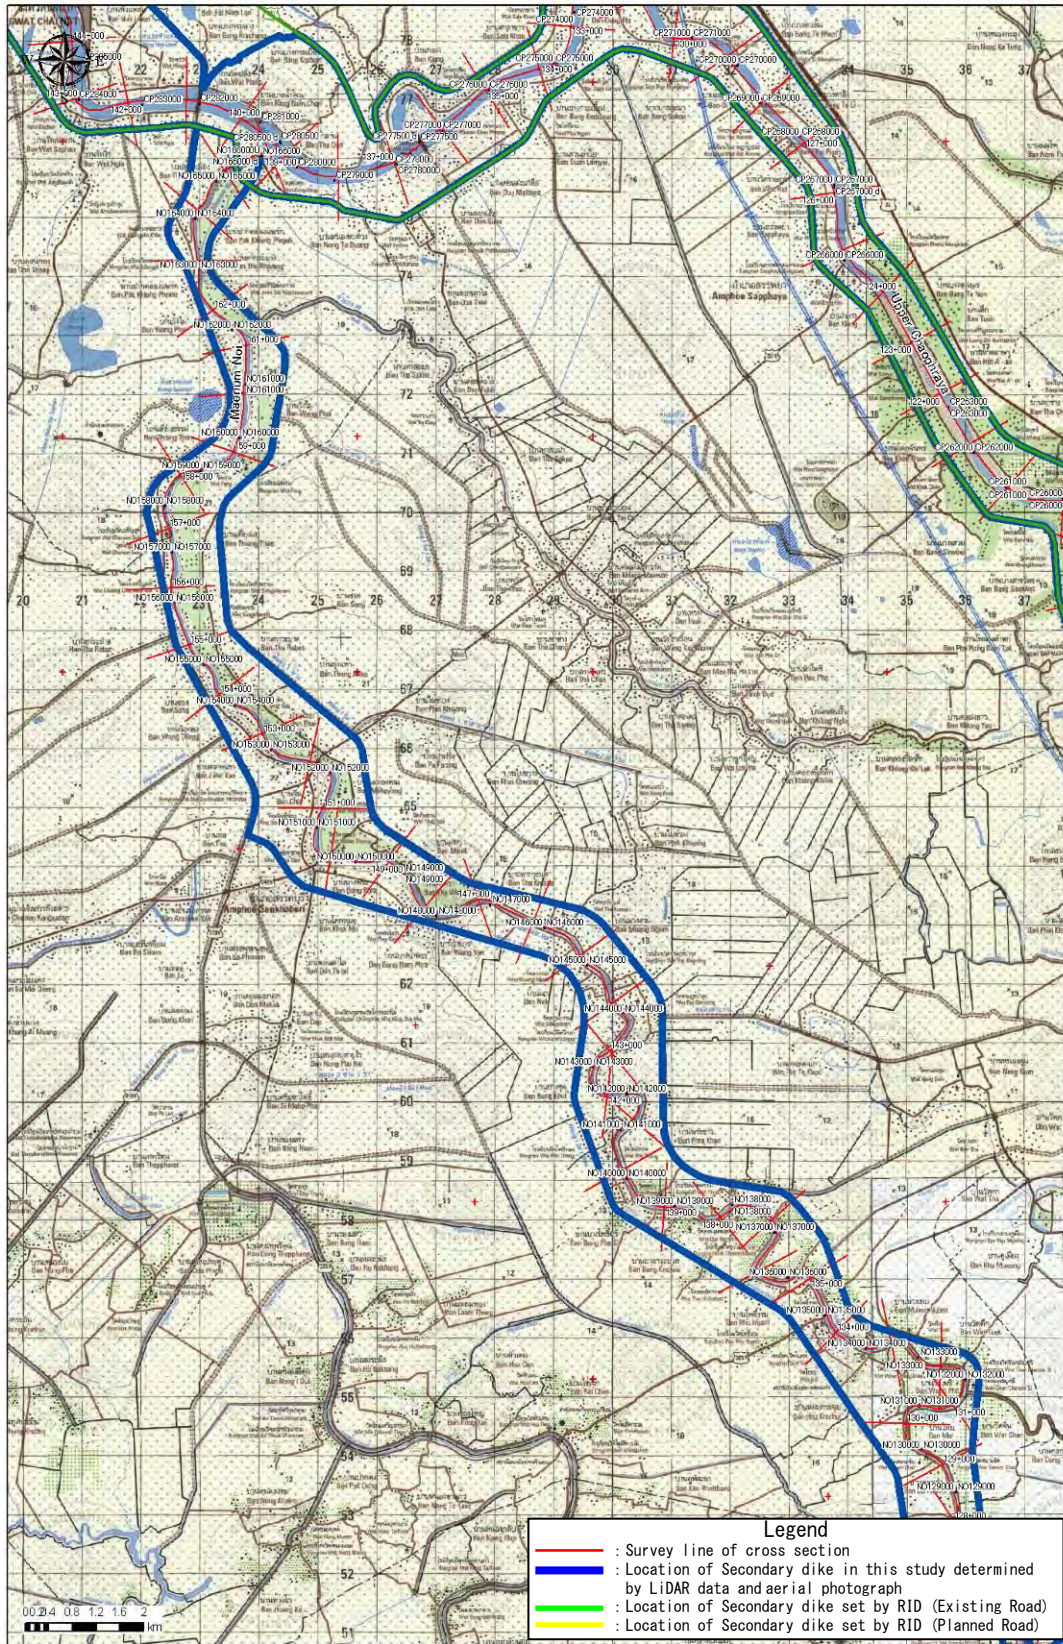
Location of Cross-section & Secondary dike (88)
